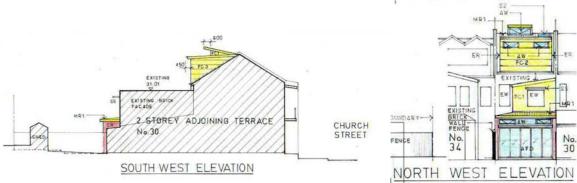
Approved side and rear elevations of attic extension to the north-east at 32 Church Street.
